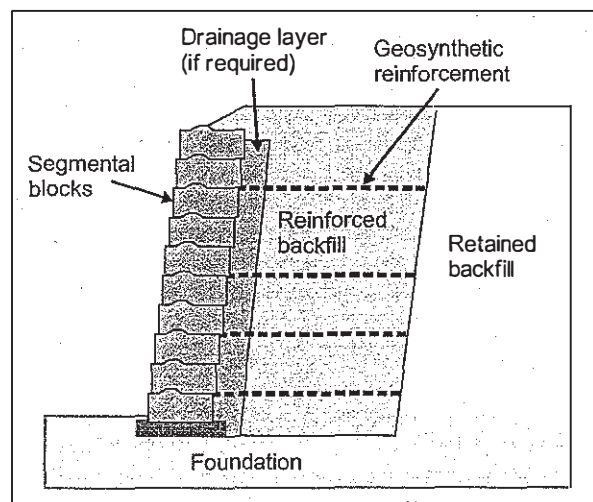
Typical features of a geosynthetic reinforced segmental block retaining wall.
